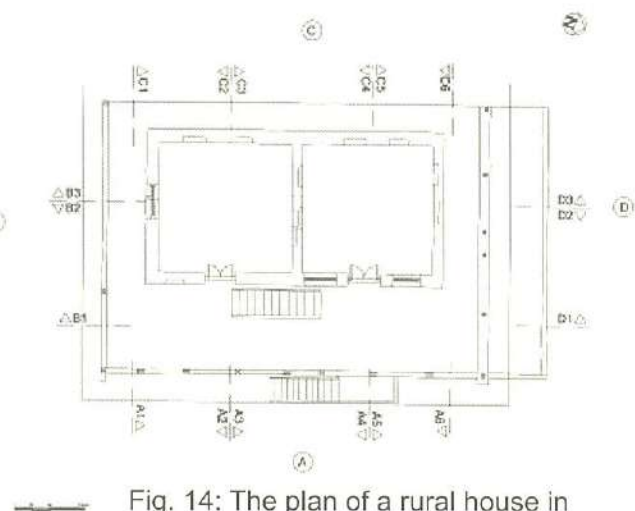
The plan of a rural house in the eastern plain of Guilan
